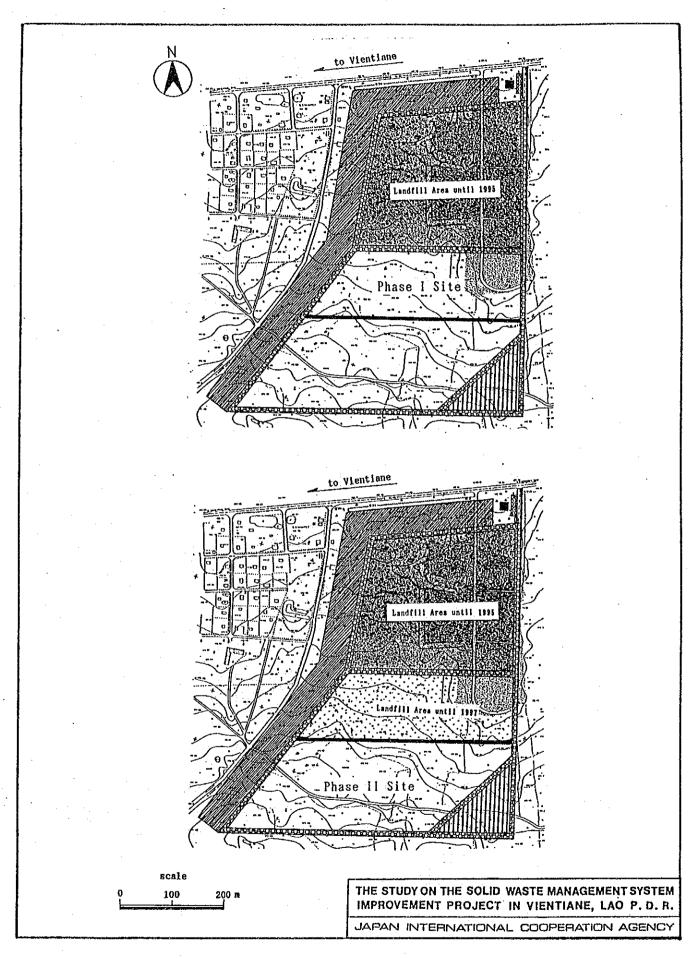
Staged Development Plan for KM 18-DS
